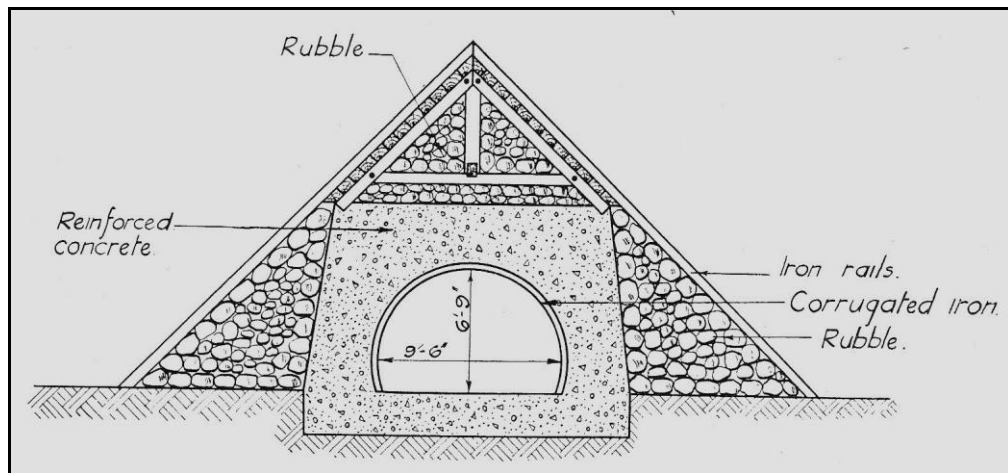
Corrugated iron shell encased with concrete and rubble (CCA n.d.c: 14)
